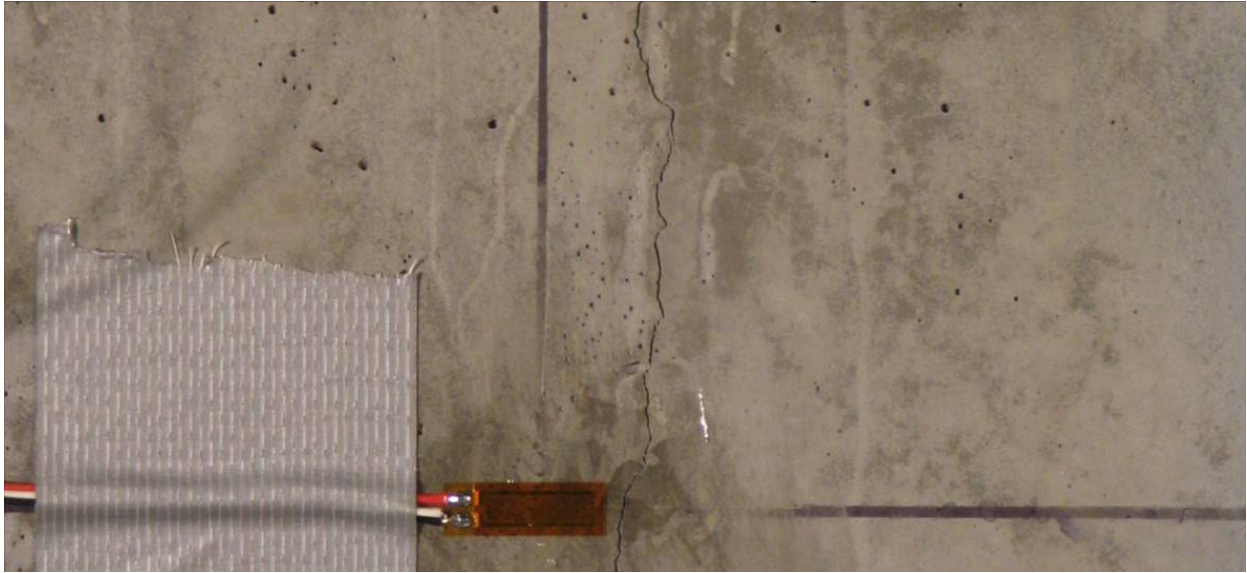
Photo. Crack on south face of Girder P4-45F at 1070 kN (240 kips).
